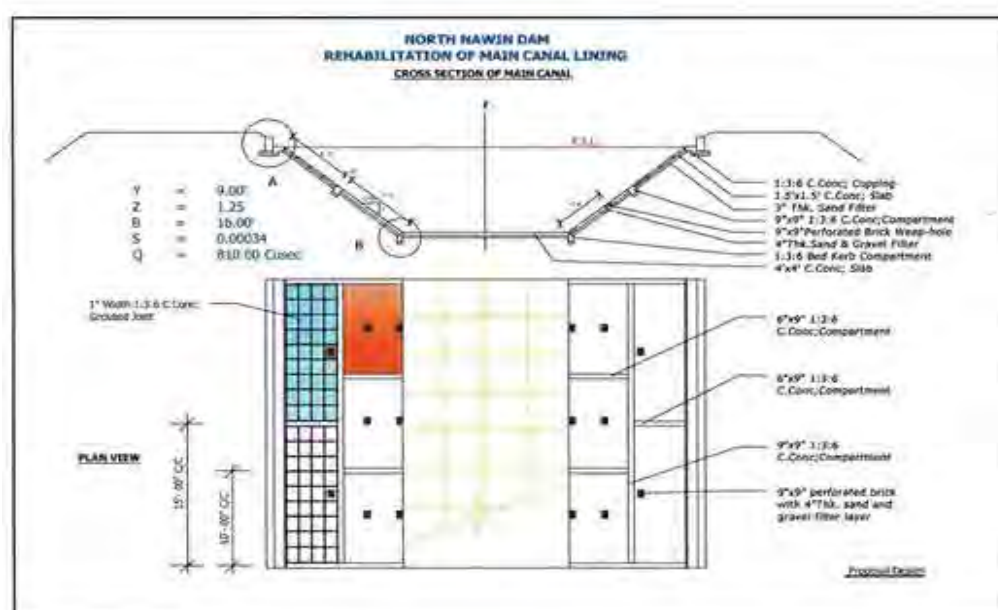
Typical Cross Section of Concrete Lining at Main Canals for North Nain Irrigation System
